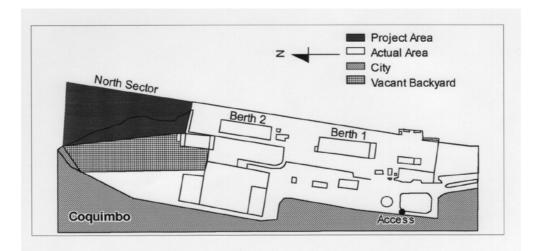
Layout and Project Site of Coquimbo Port
